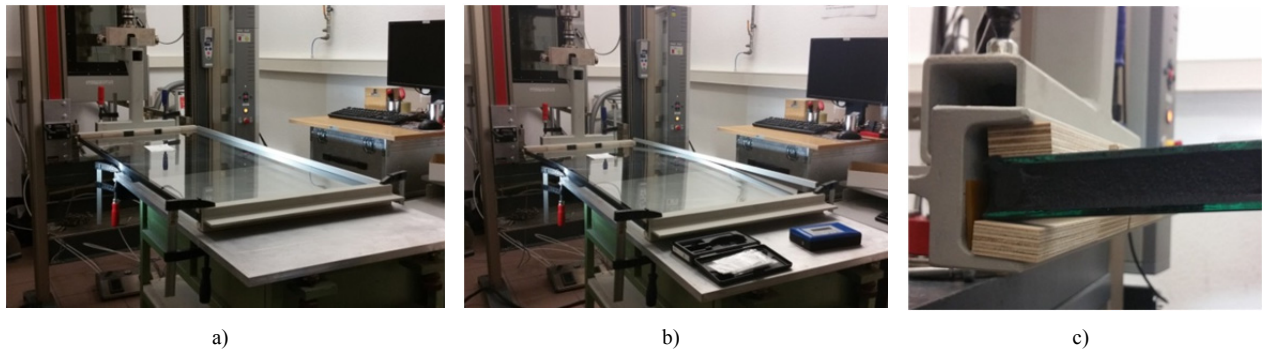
Test Assembly for the 1-axial bending tests with 1 500 mm x 600 mm IGUs;
